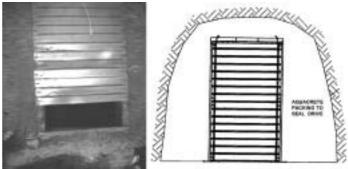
Photographic views and engineering drawing of a half size C-section regulator.
